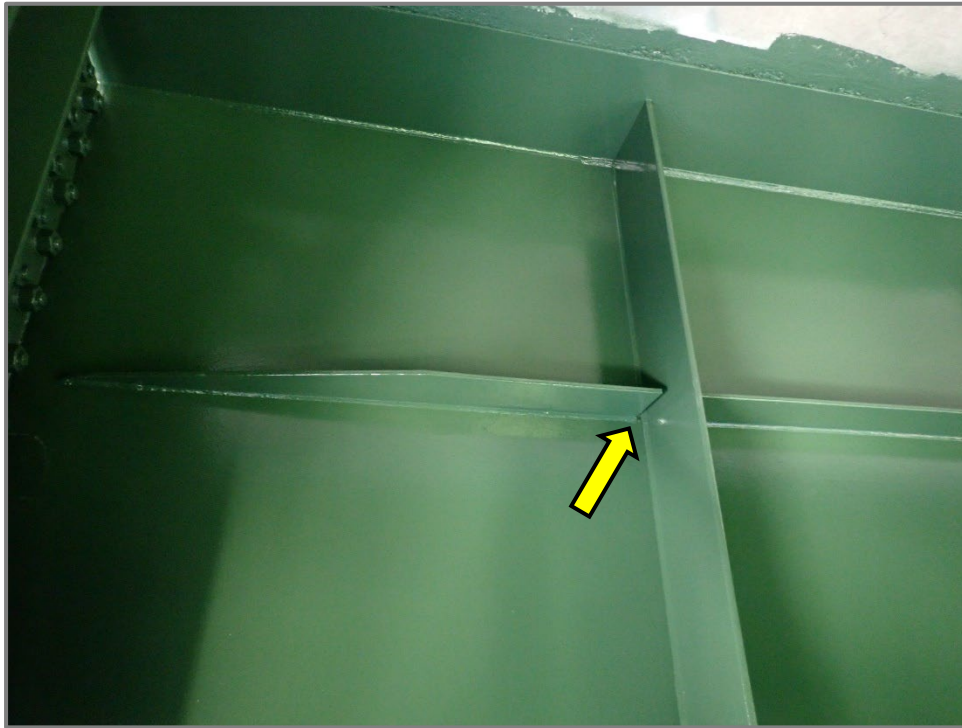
Base metal at the end termination of longitudinal stiffener to girder web welds with no transition radius (Category E). Girder E at Floorbeam 18 shown, looking northeast.
